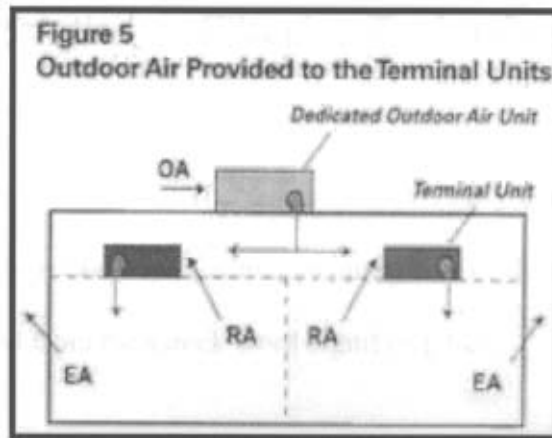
Typical Mechanical Ventilation for HVAC System
